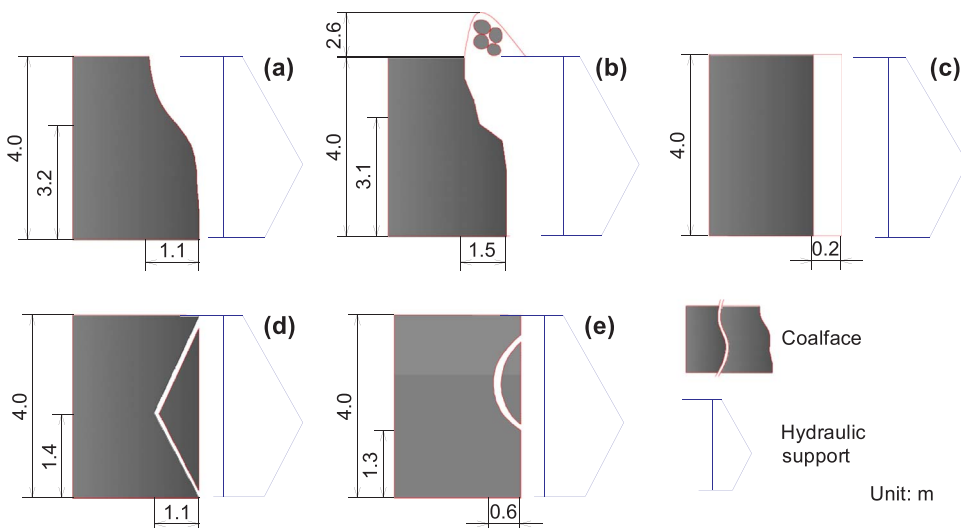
Typical coal face failure forms in coal face 8102. (a) Upper-rib spall; (b) Upper-rib spall and roof caving; (c) Integral spall; (d) V-shaped spall; (e) Arcuate spall.
